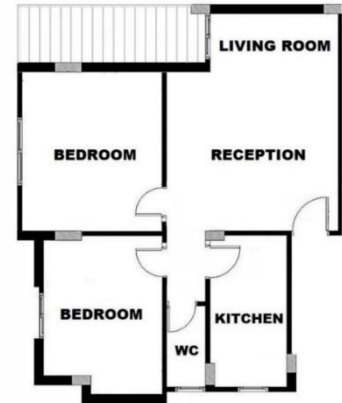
Plan of a residential unit in Al-Hourrya buildings
